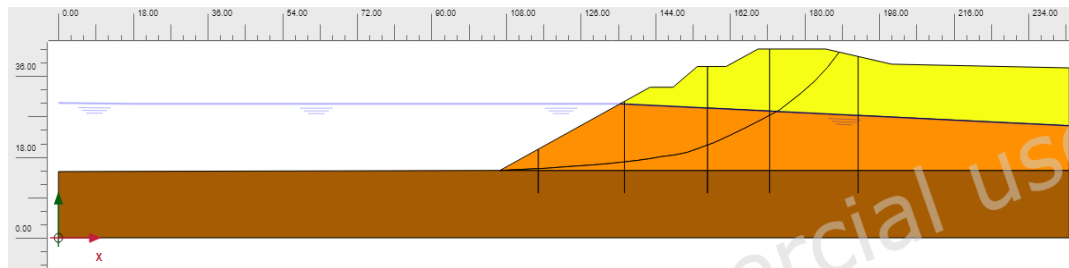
Initial cross-section used in linear elastic modeling of Wachusett Dam - North Dike
